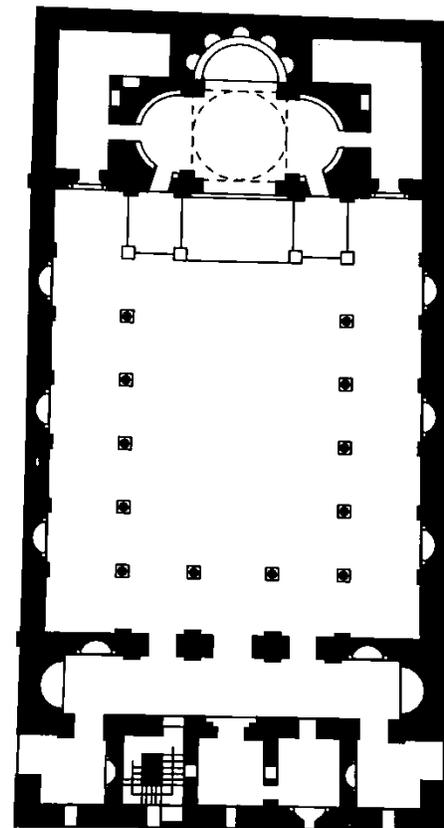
Ground plan of the triconch church in Dandara (Capuani 2002, p. 224)
